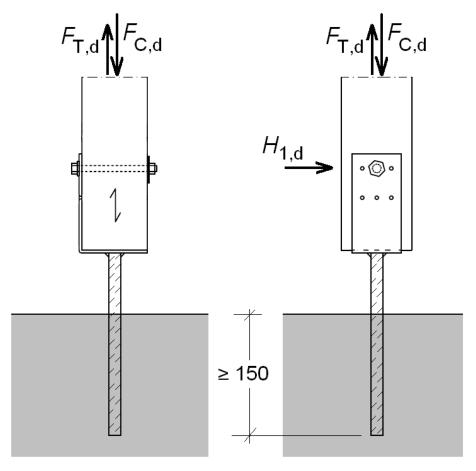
Use of Column Shoe type L and the definition of forces.
